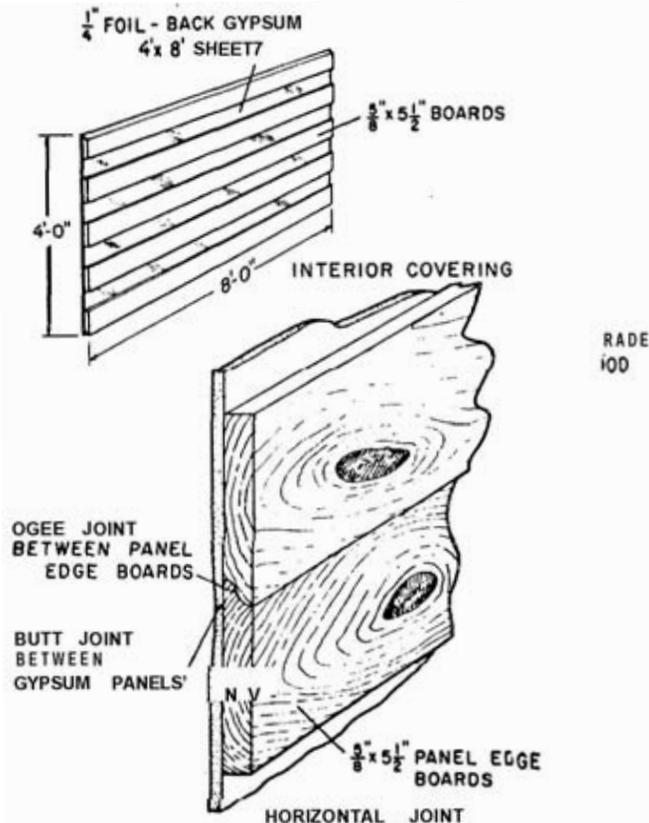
Interior drywall covering for walls and ceilings (Perm-board).
